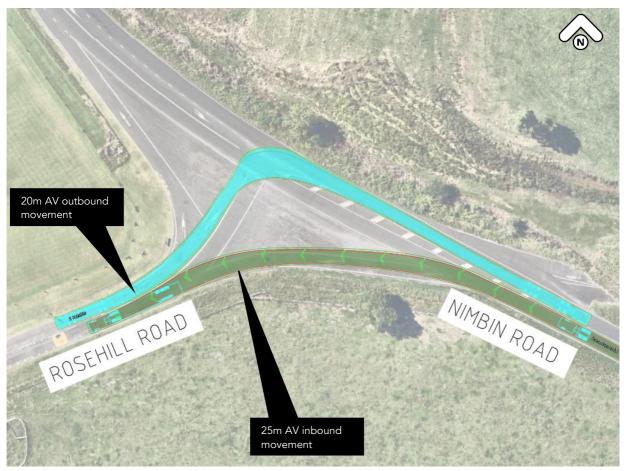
Swept path 3 - Nimbin Road / Rosehill Road
